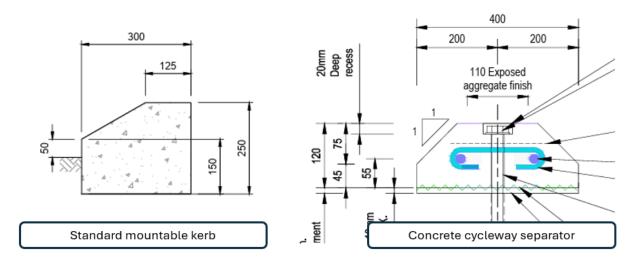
Standard mountable kerb detail in comparison to the concrete cycleway separators installed along the
